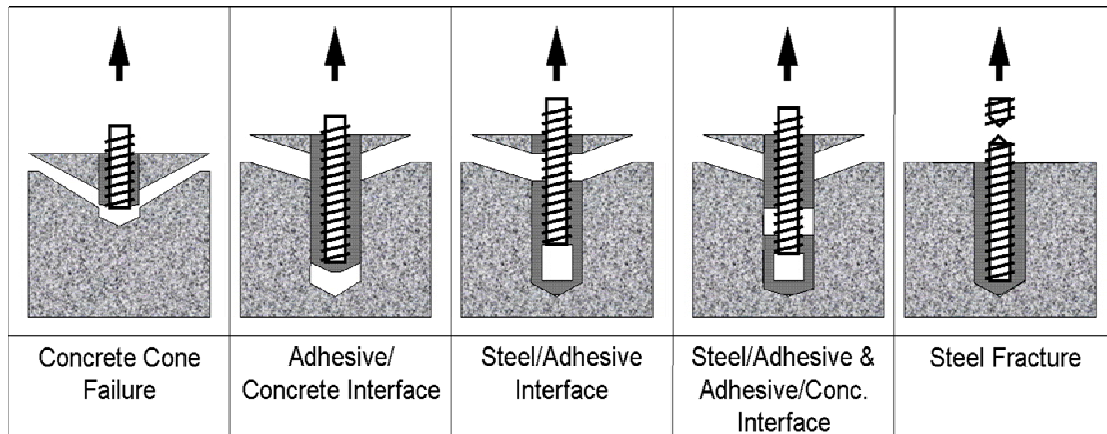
The five possible failure modes of adhesive anchorage to concrete. [Cook et al 1998]
